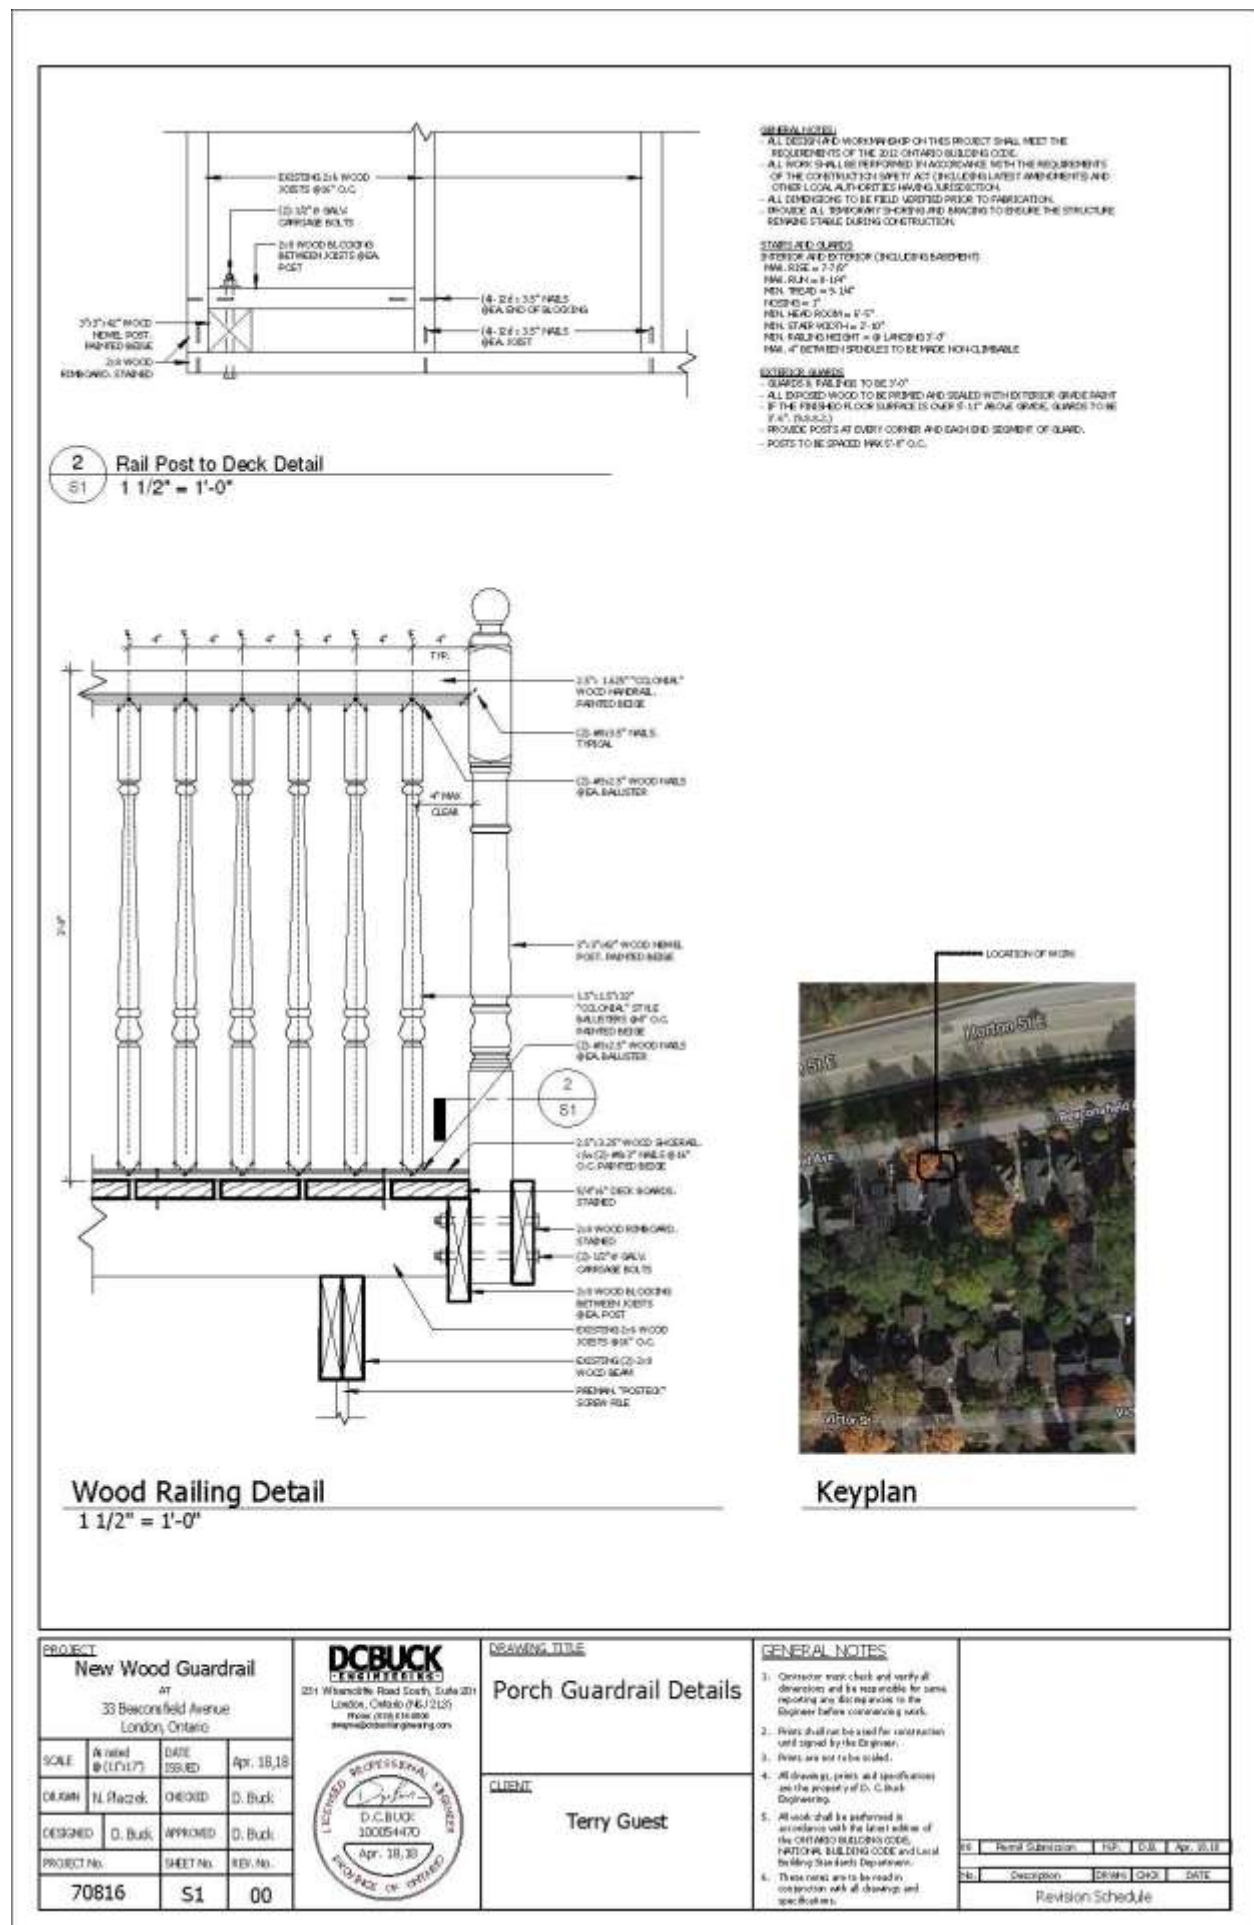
Drawing showing proposed porch railing and spindles for the porch at 33 Beaconsfield Avenue.
